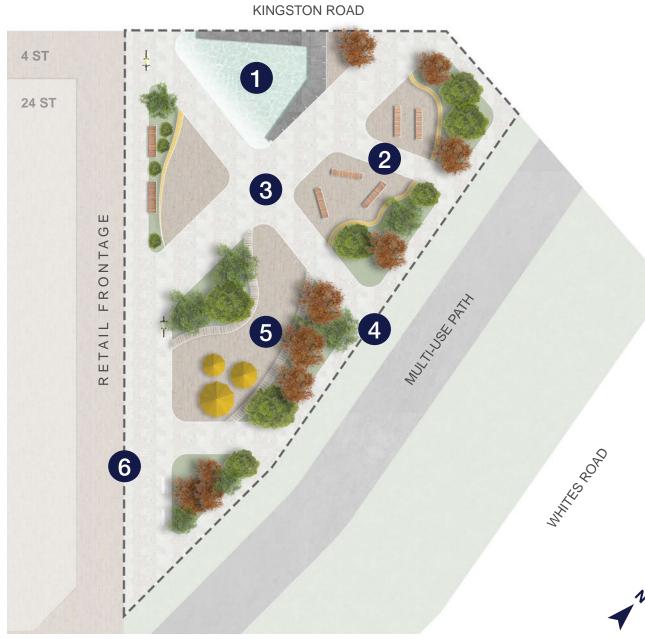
Conceptual Gateway Plaza Design Prepared by Weston Consulting
